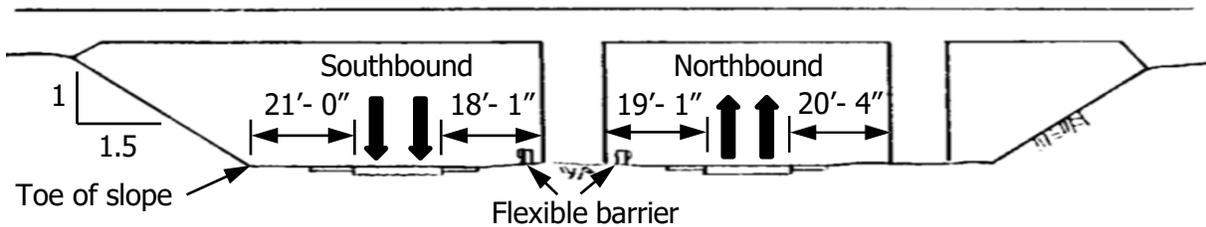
Bridge elevation view of horizontal clearances for separate southbound and northbound highway features below the bridge, with flexible barriers.
